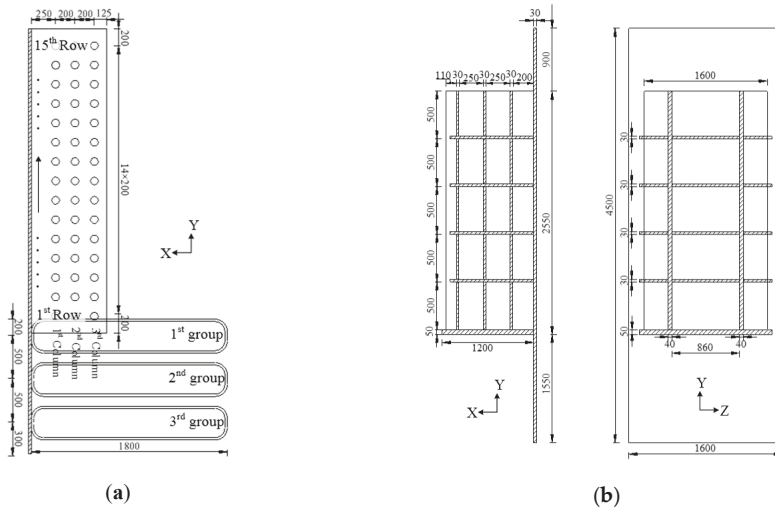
The layout of the thrust shoulder: (a) Grouped PBL shear connectors and U-shaped anchor rebars, and (b) grille frame.
